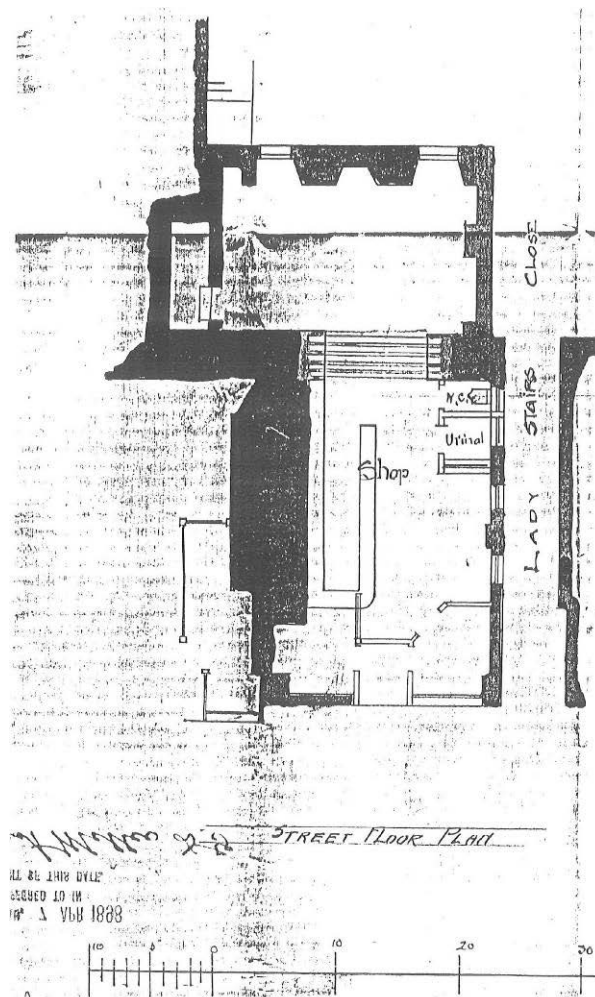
Plan showing warranted alteration for a new slapping to unite the ground floor of building adjacent to Gladstone's Land to E. Application dated 7th April 1898. City of Edinburgh plan store, used in Addyman & Kay 2000
